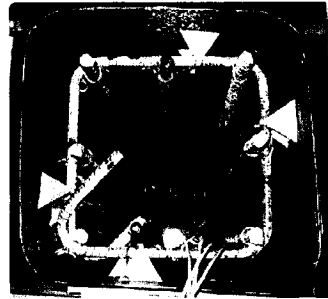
Geometry and reinforcement arrangements used in column tests
